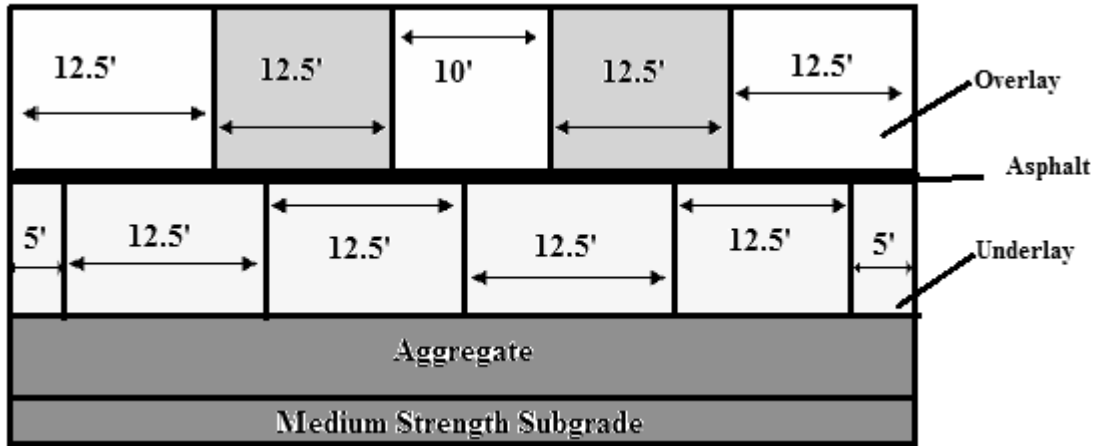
END VIEW OF LONGITUDINAL JOINT LOCATIONS FOR OVERLAY AND UNDERLAY SLABS (SLAB DIMENSIONS IN FEET)
